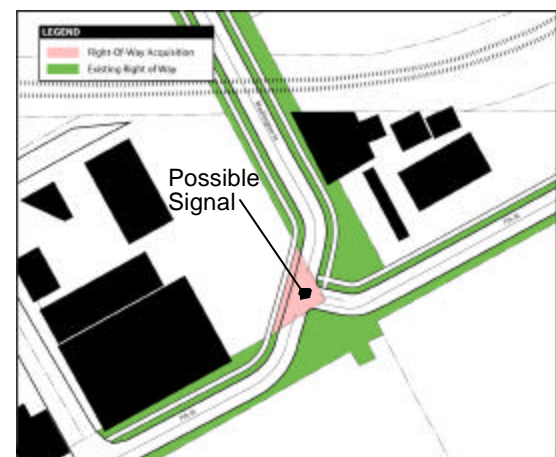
Alternative design concept for Washington Avenue and Seventh Street
